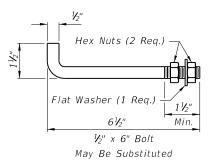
DETAILS FOR CONCRETE & CORRUGATED METAL PIPE
